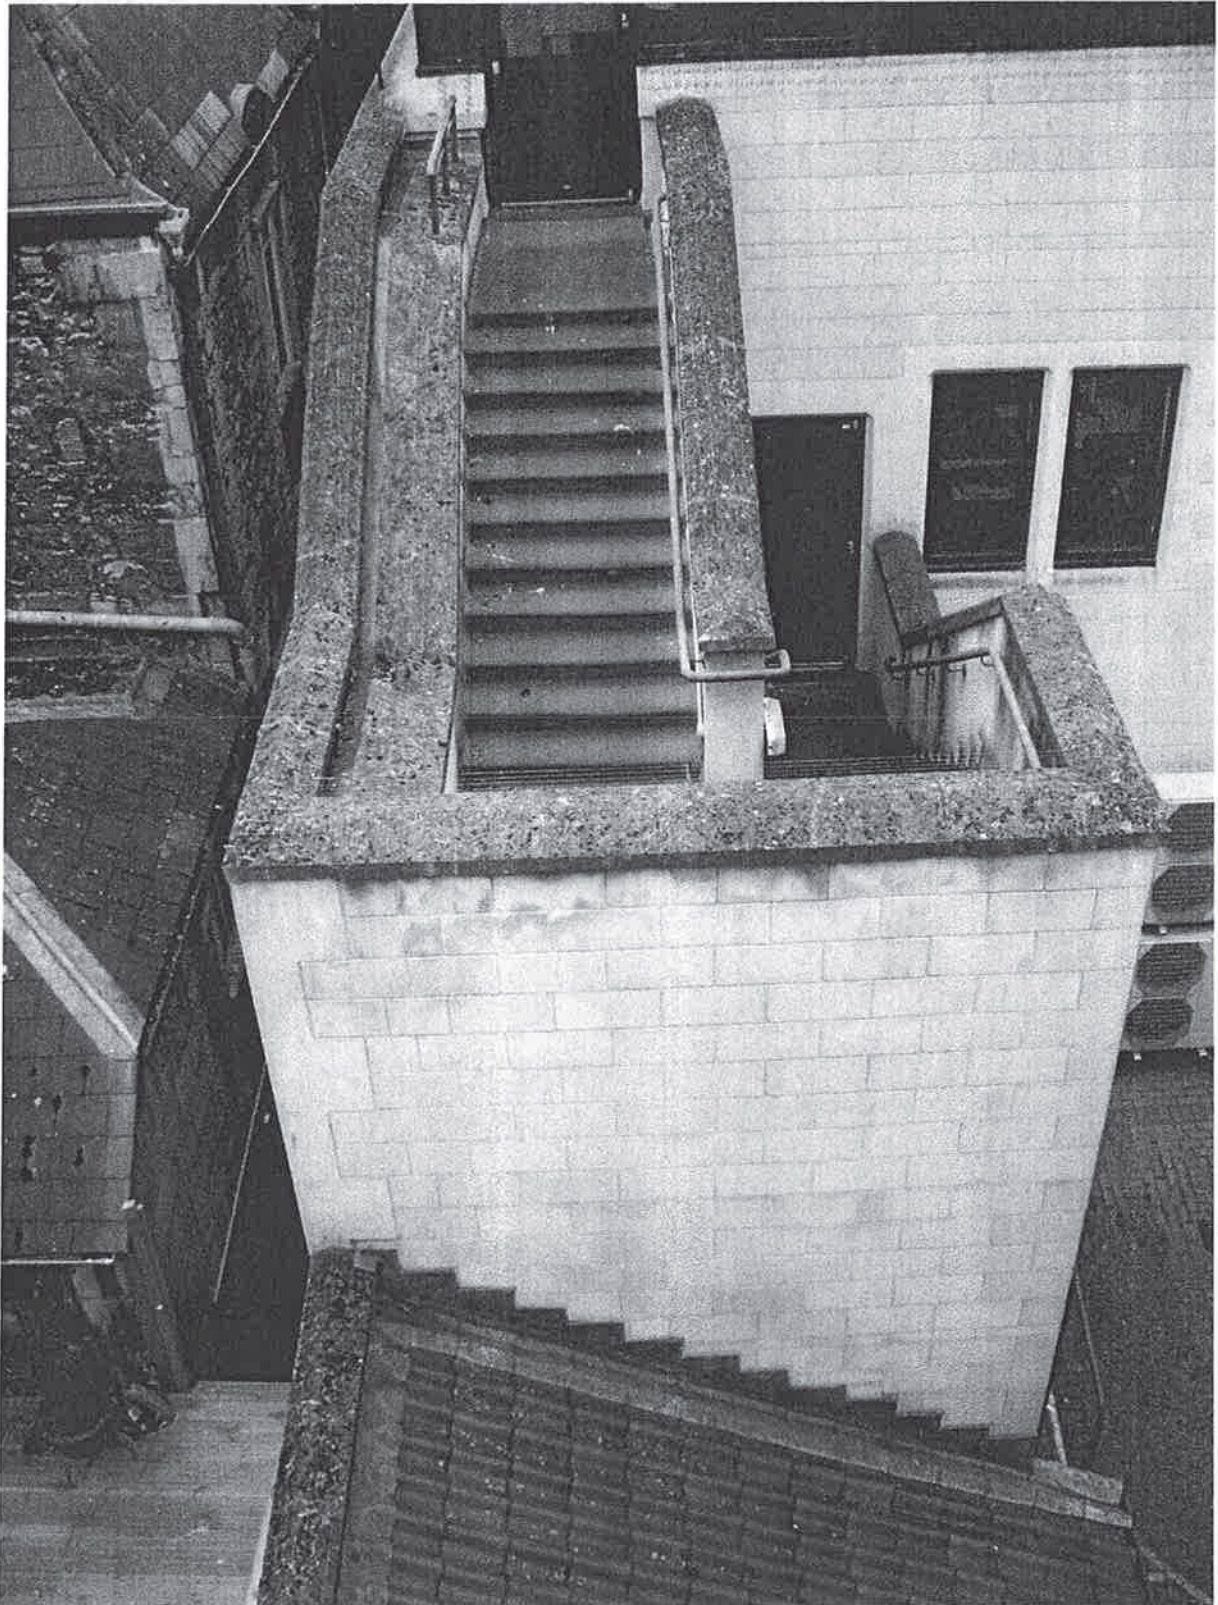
showing ease of access from Fubar's terrace to IPL's stairwells
